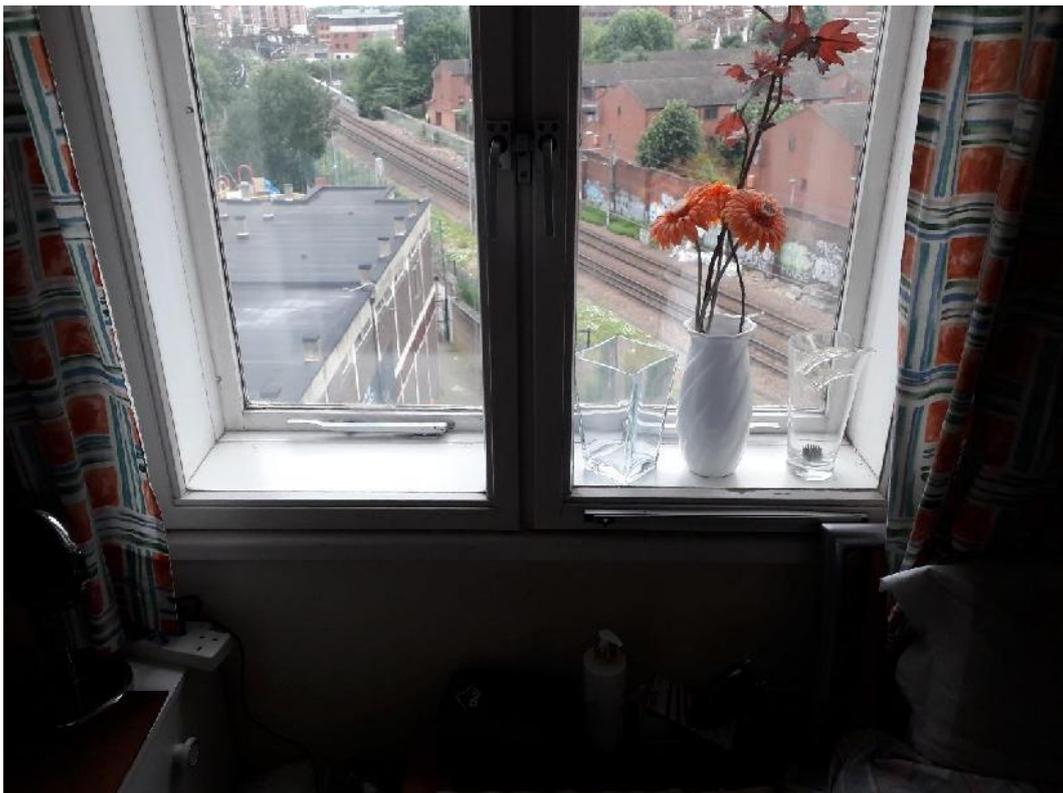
Secondary Glazing, Flat 4 Ebony House
